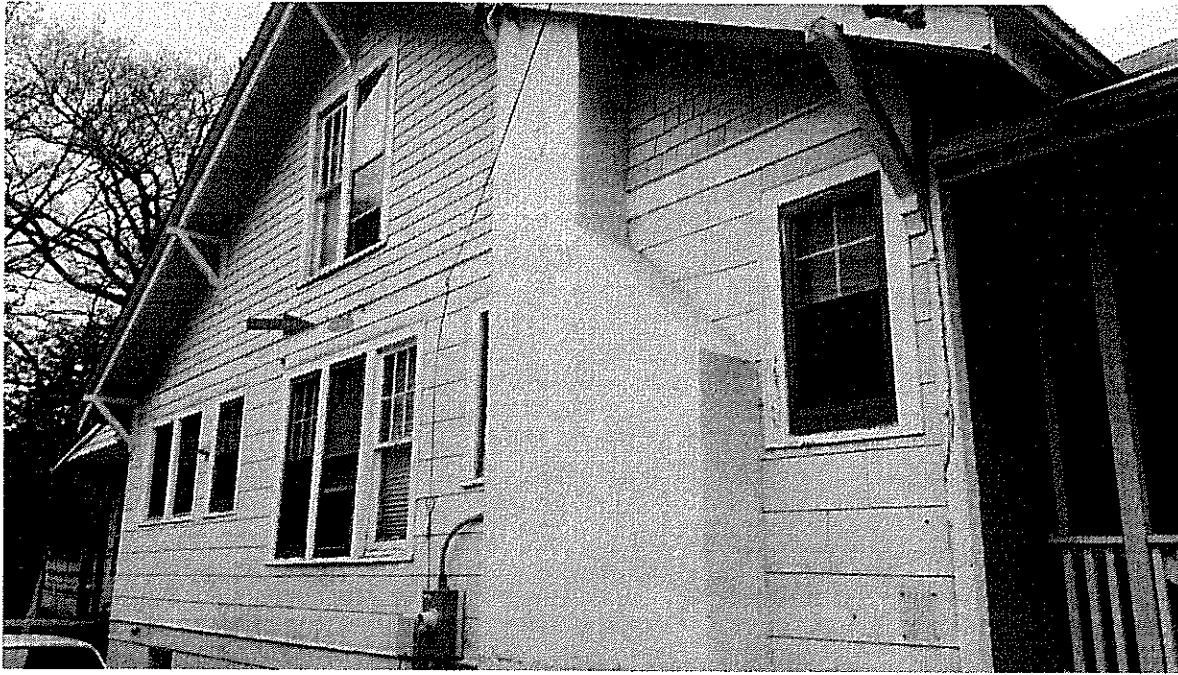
Detail: Figure 3. East side trellis / lattice to be changed; location of new outdoor electric box.
